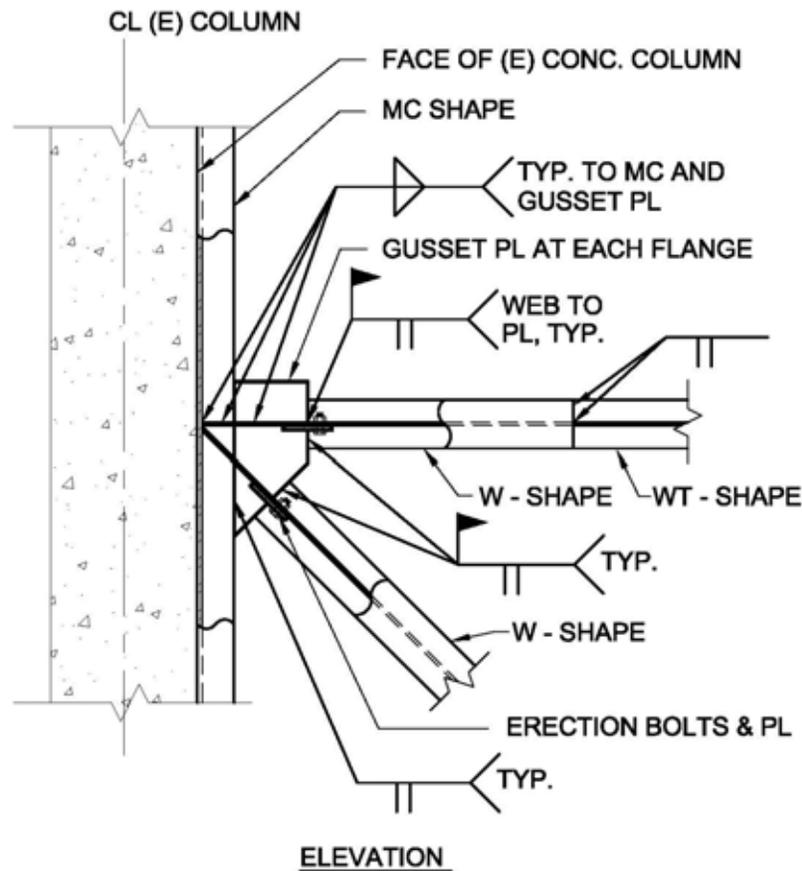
Test Specimen Connection Detail for Braced Frame
